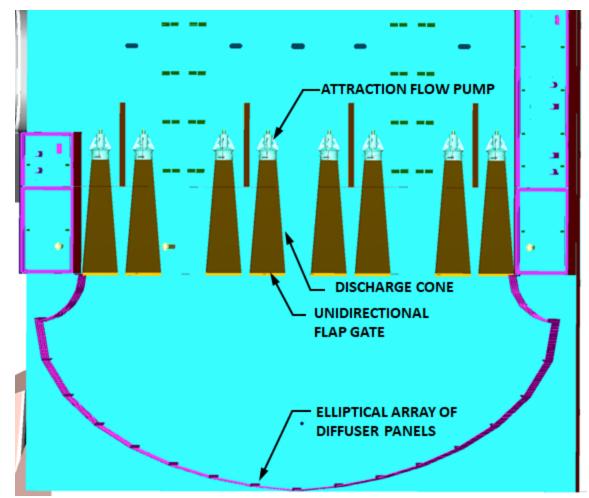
Plan View of Elliptical Diffuser System Arrangement.
